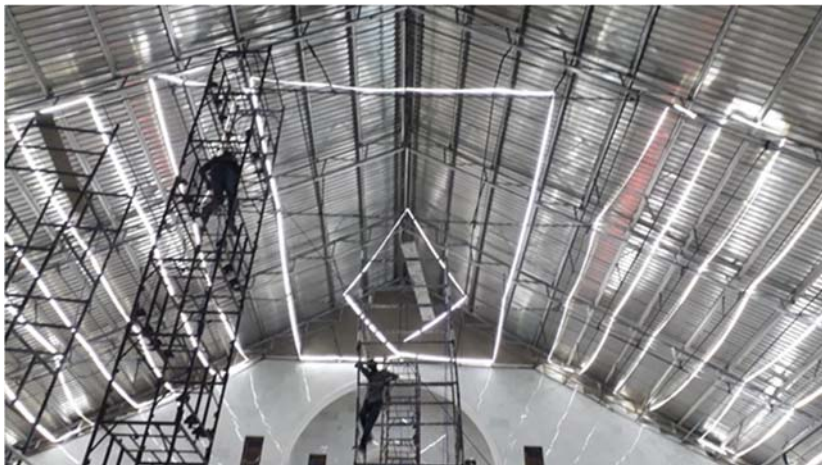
Project of stretched ceiling in Maiduguri, Nigeria, Source:[14]
